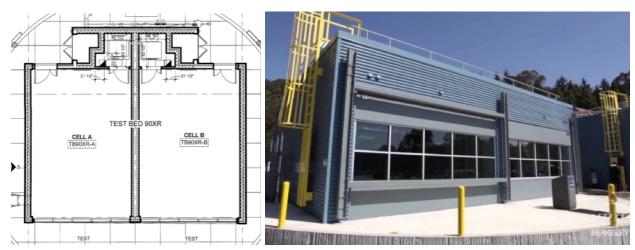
FLEXLAB testbed layout (left) and image of south-facing facade of testbed (right)
